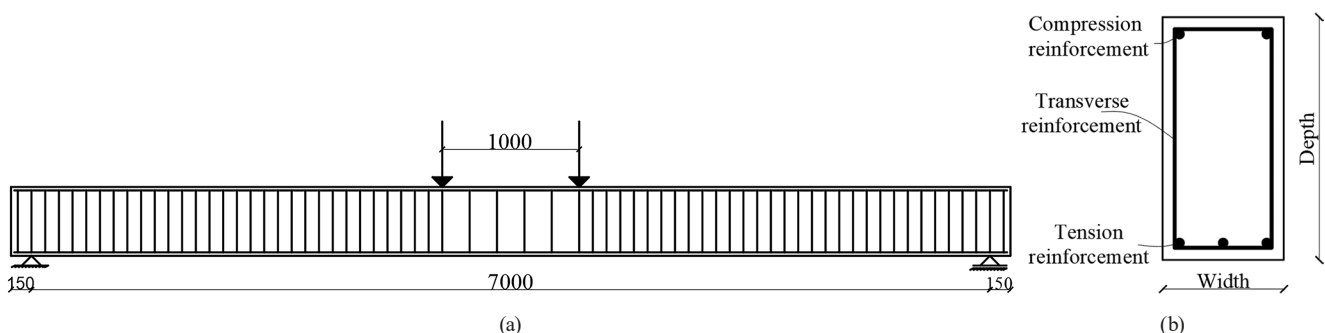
RC beam with steel and GFRP rebar: (a) longitudinal cross section and (b) cross section
